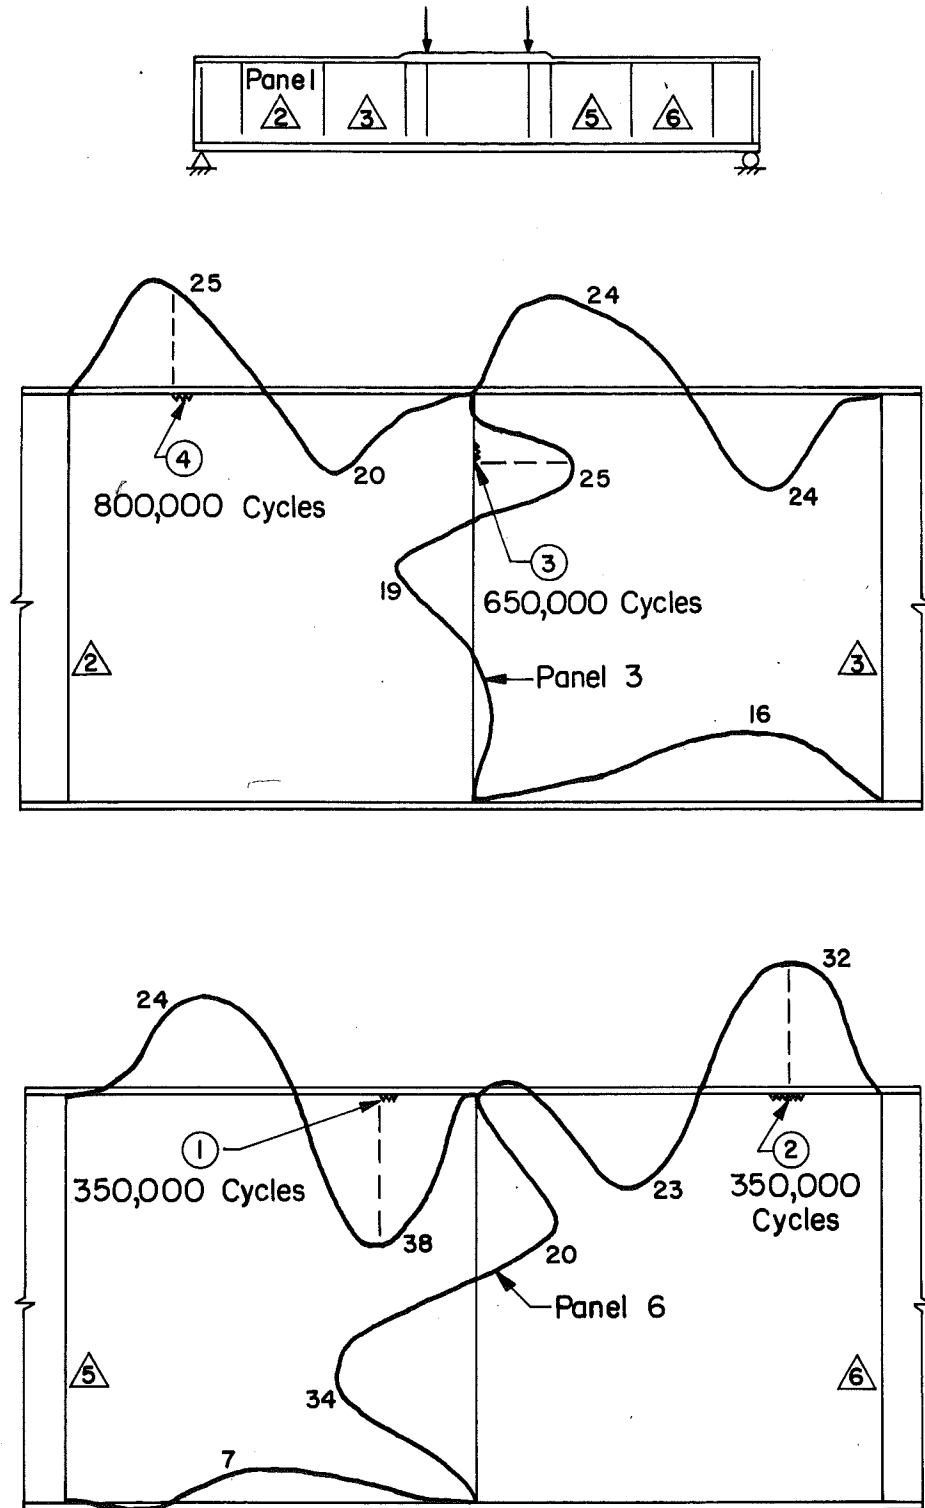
Plate Bending Stresses Compared with Cracks on One Girder
